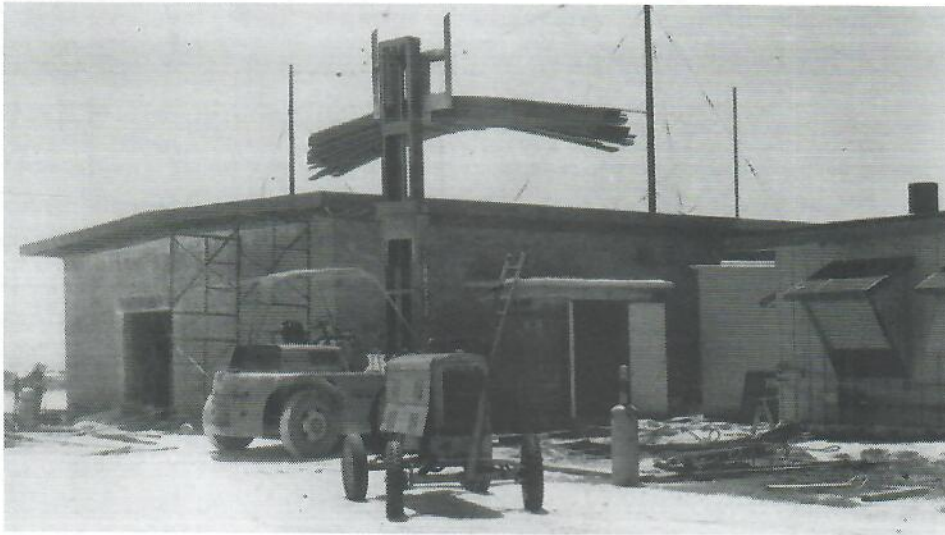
Finishing touches being added to LORAN building, Tern Island, May 1964. Photograph by Hoogland.
